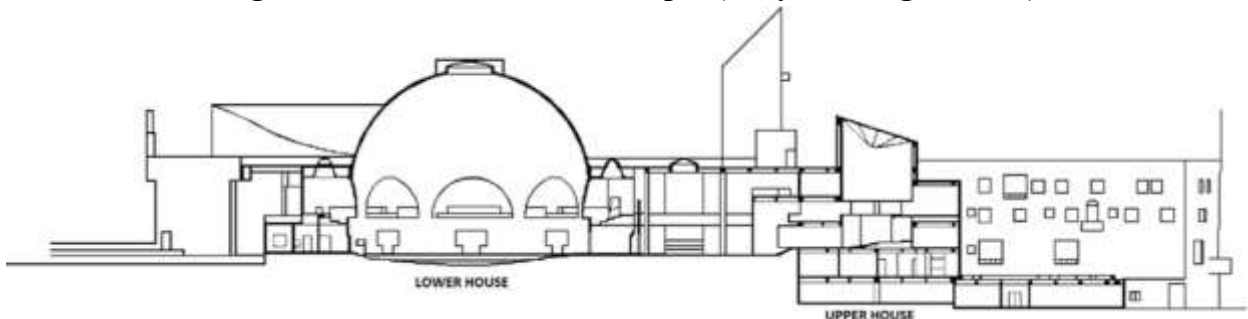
Section through Vidhan Bhavan, Bhopal (Sanyam Bahgan, 2018)
